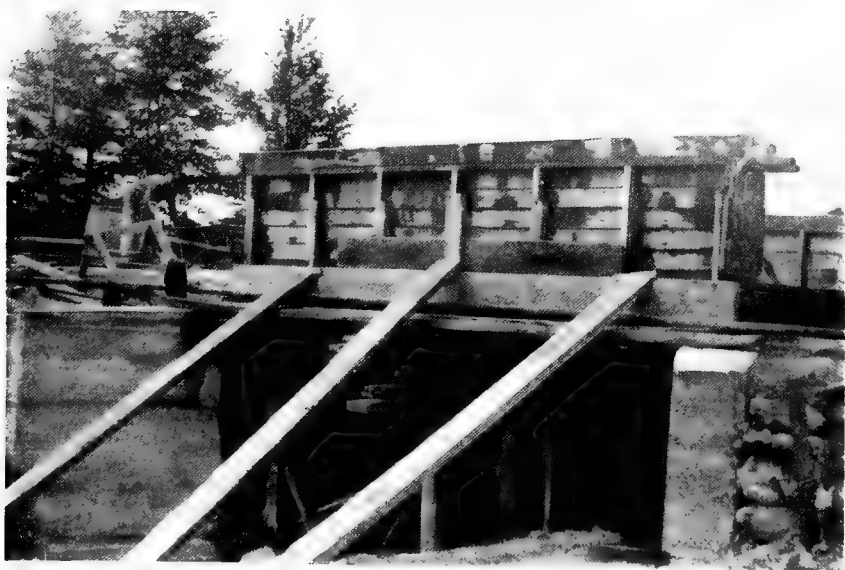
Flat Slab Bridge, Wayne County, Michigan. 7-inch slab; 8-foot span; 18-foot roadway. This view shows forms in place and method of bracing.
